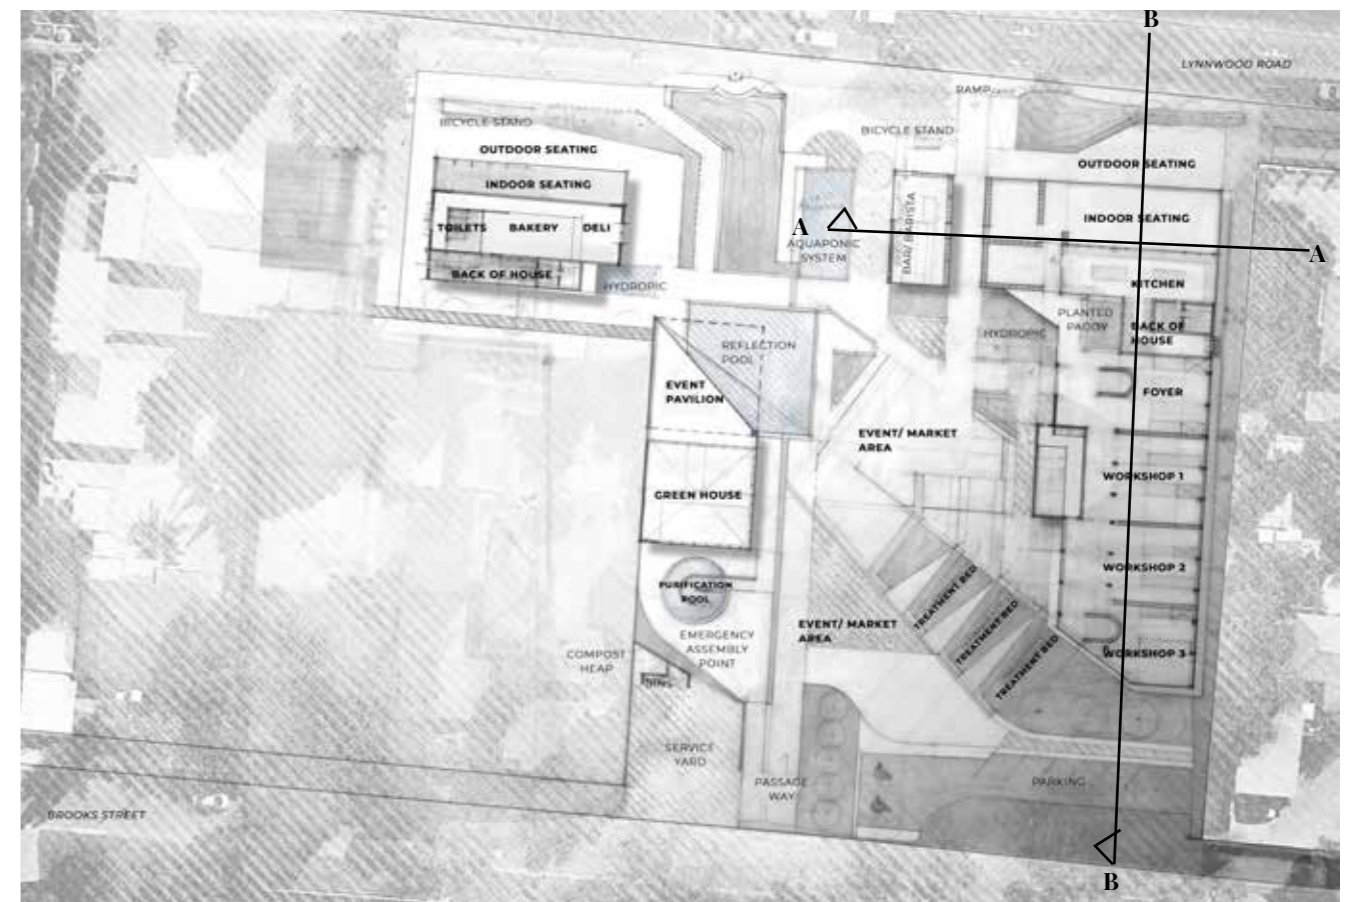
Initial hand drawn ground floor plan of site (Author, 2020)
